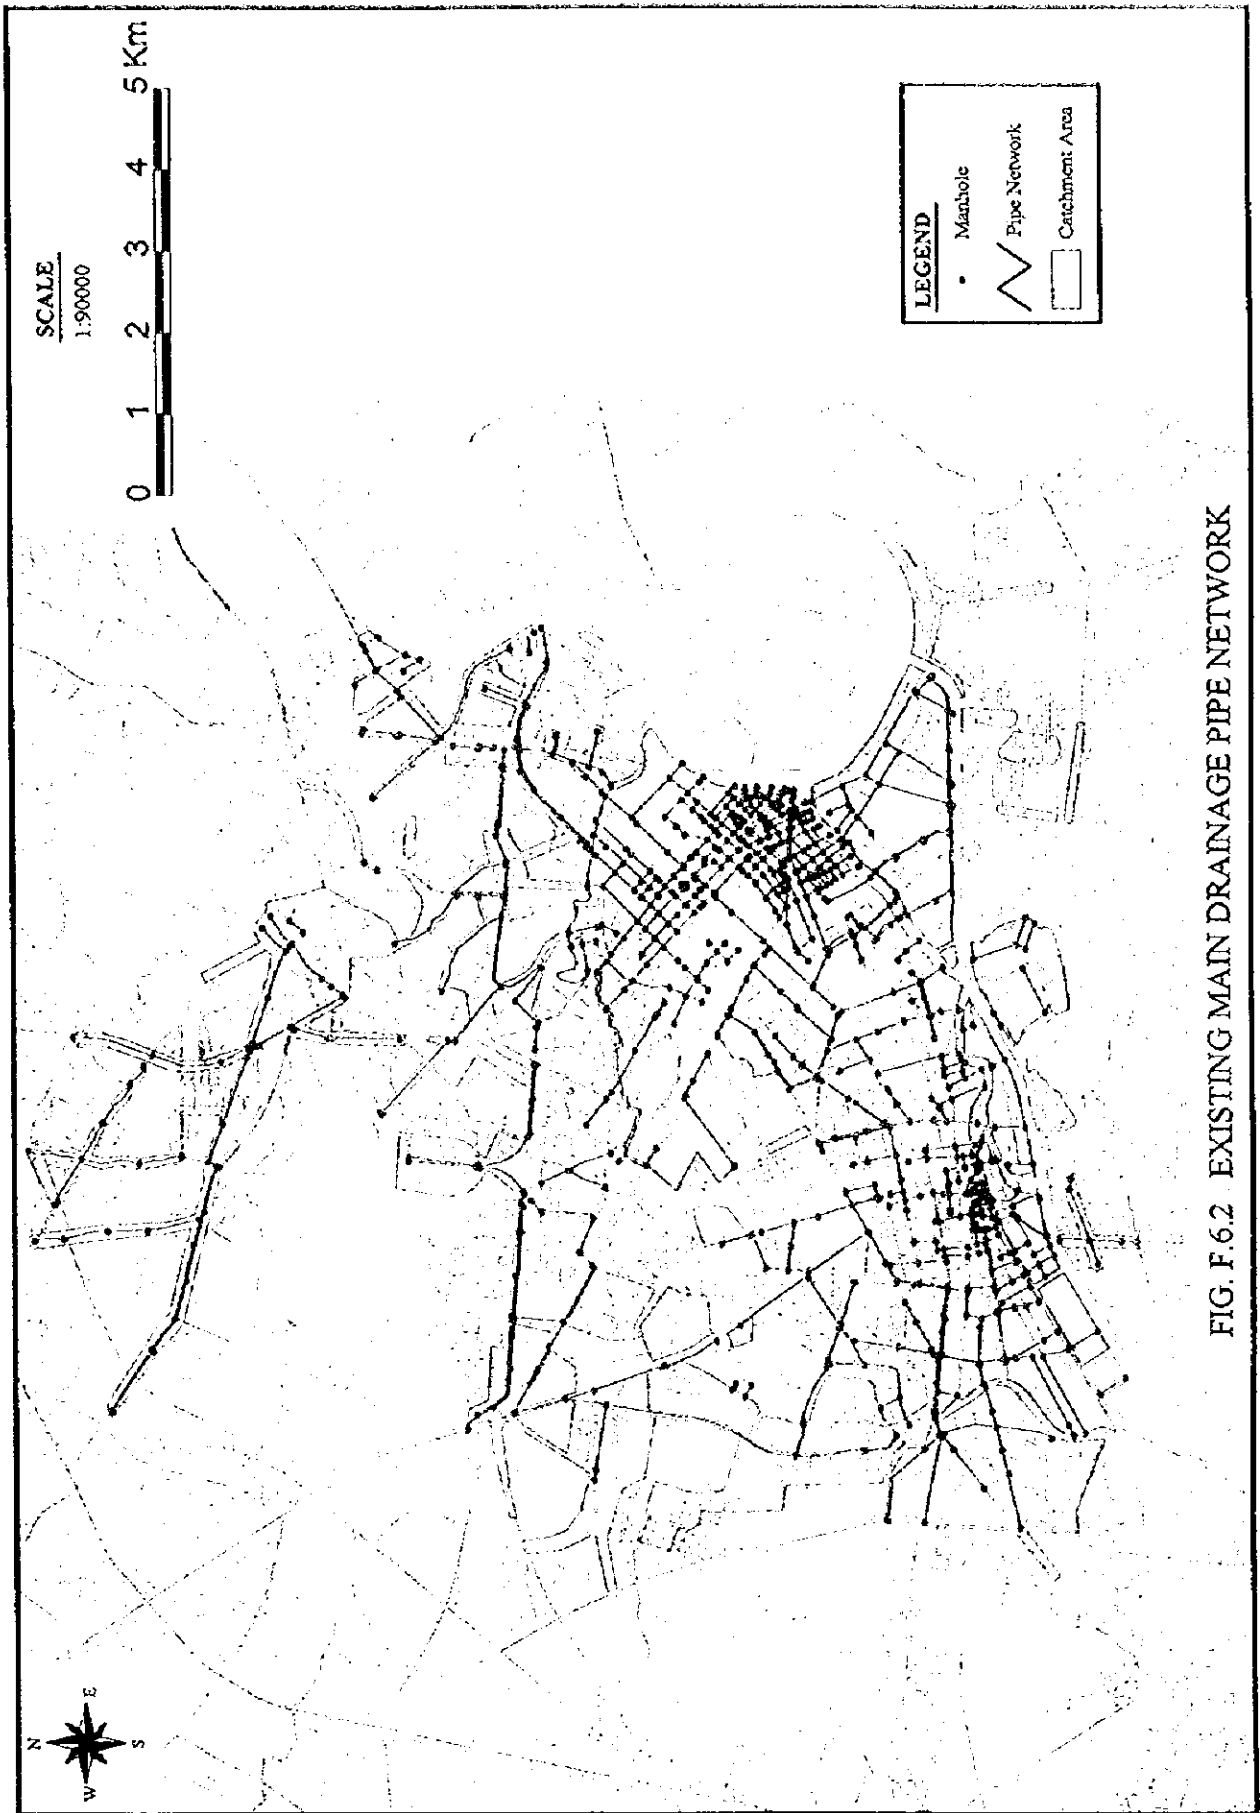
EXISTING MAIN DRAINAGE PIPE NETWORK
